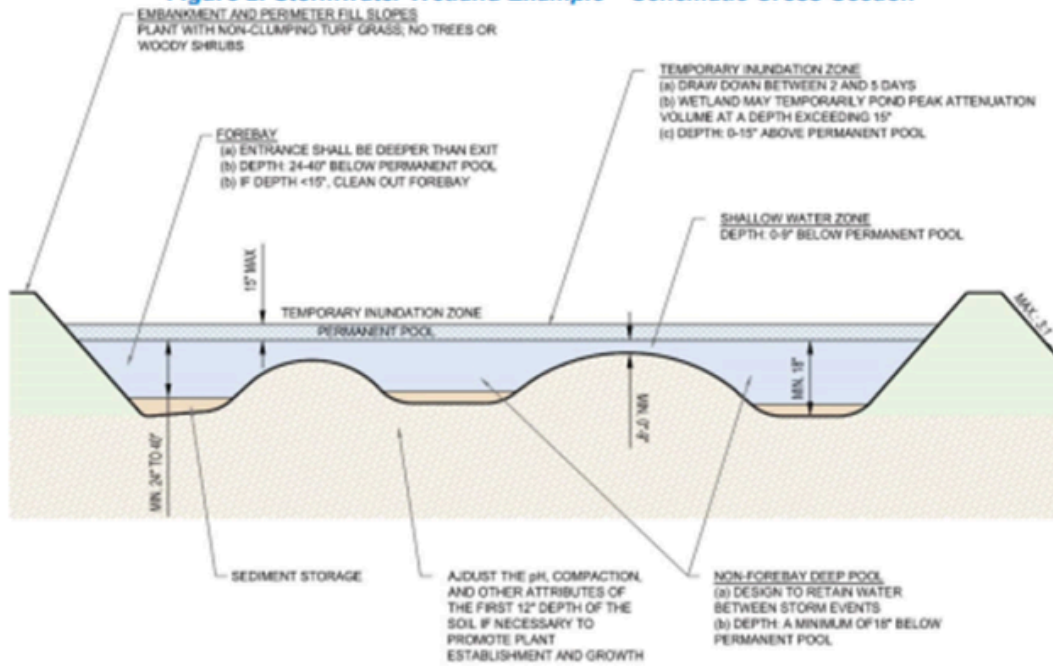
Stormwater Wetland Example – Schematic Cross-Section
